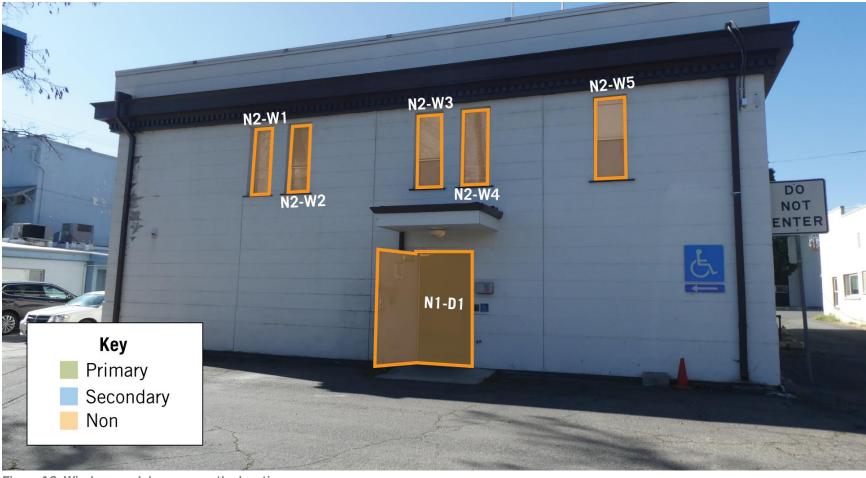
Windows and doors on north elevation. (GPA Consulting, March 2022).
